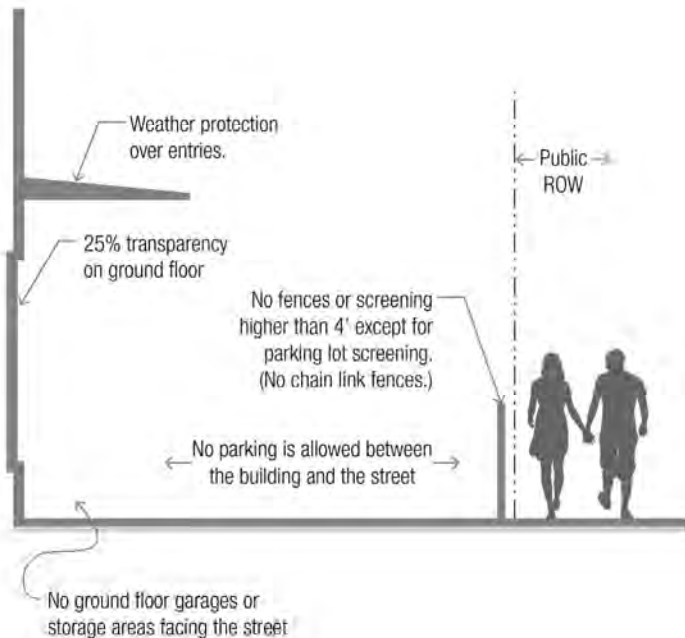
G.2: Requirements for residential buildings within 30 feet of an Entry Street right-of-way. This diagram is for illustrative purposes only. See OMC 18.120.220.G for applicable requirements.
